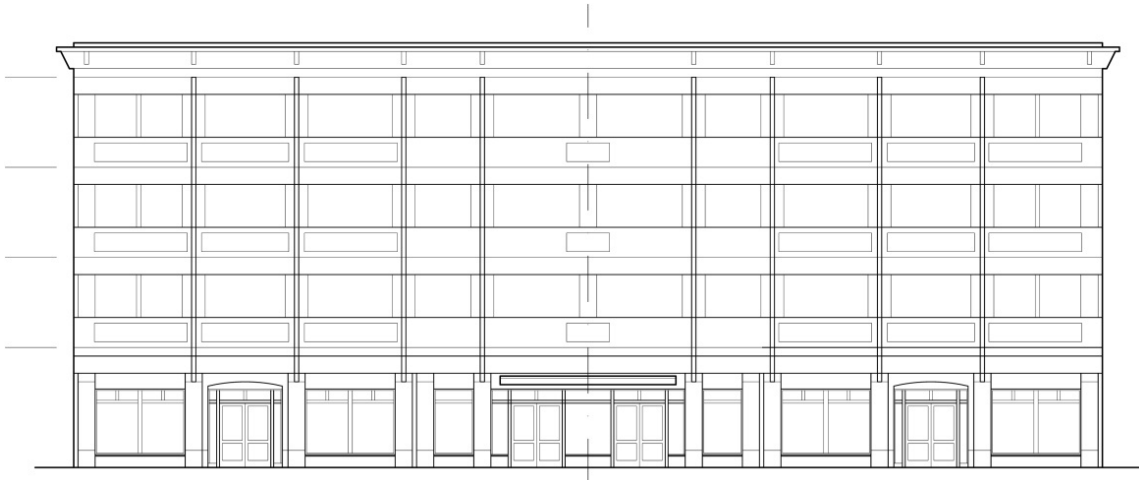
Structured Parking Facility –Architectural Façade and Cornice Treatment / Ground Floor Retail on Secondary Street
